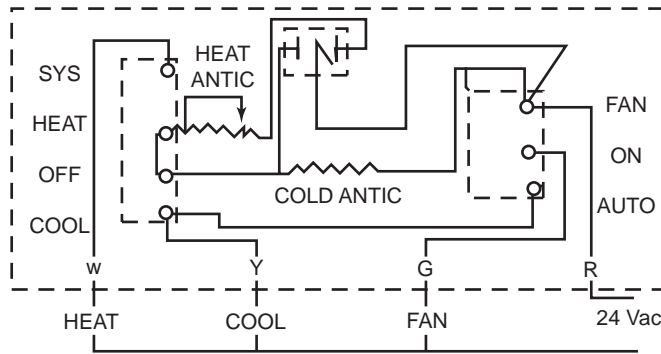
Heat/Cool Thermostat 31-101 and 31-103.
